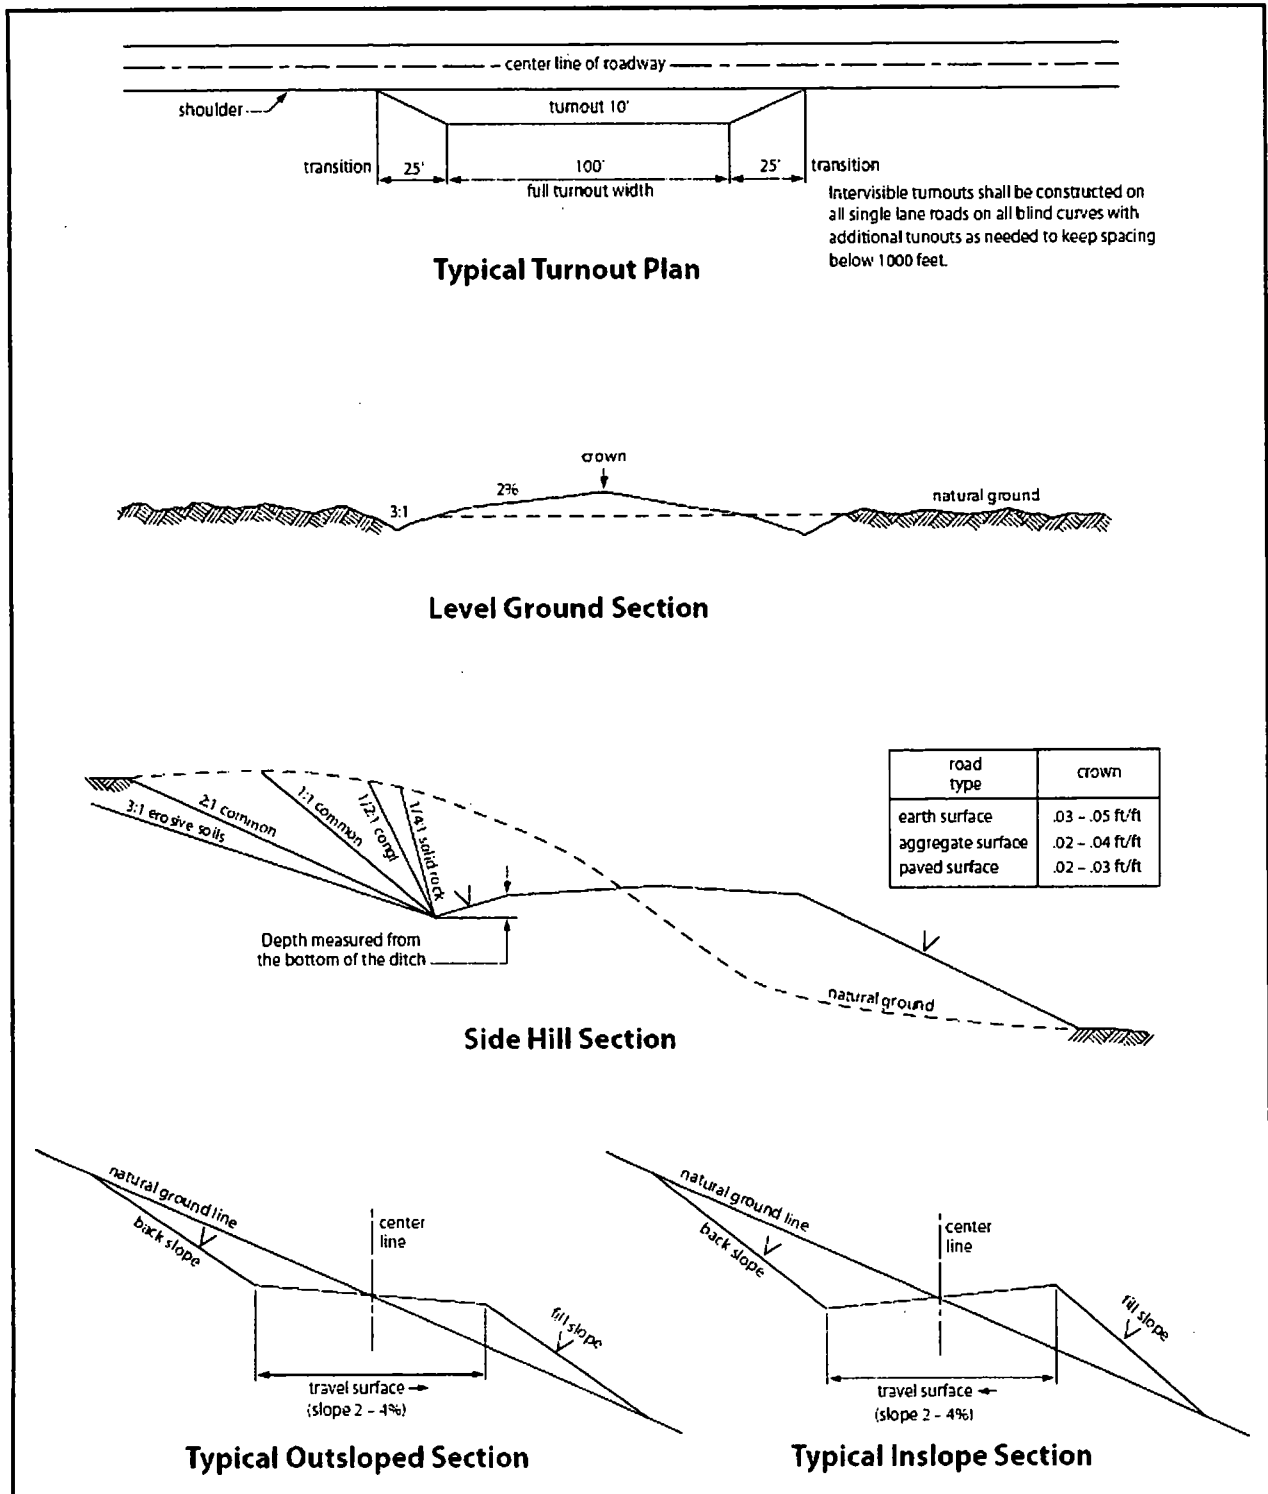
Cross-sections and plans for typical road sections representative of BLM resource or FS local and higher-class roads.
